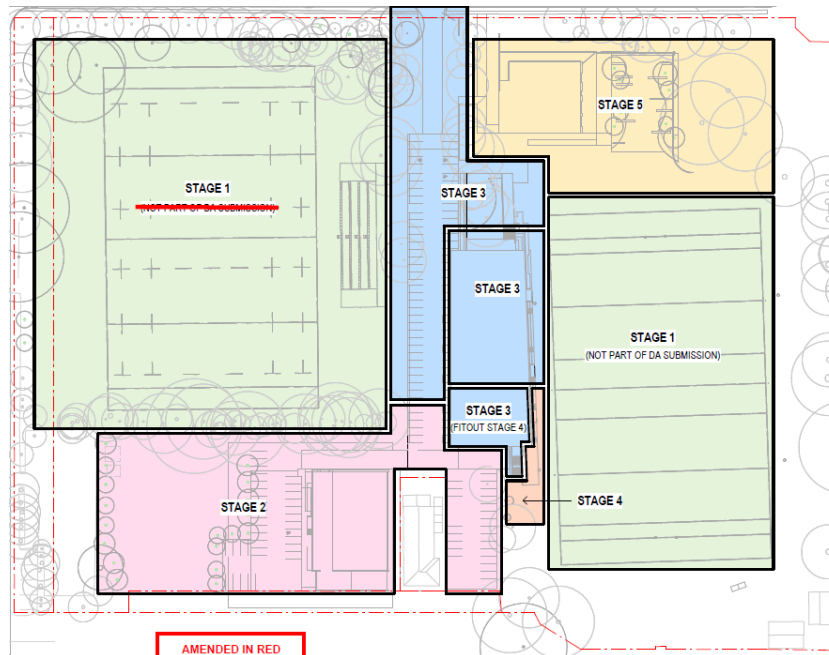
Previous Approved Staging Plan Layout (Source: Rohrig Constructions 2026)
